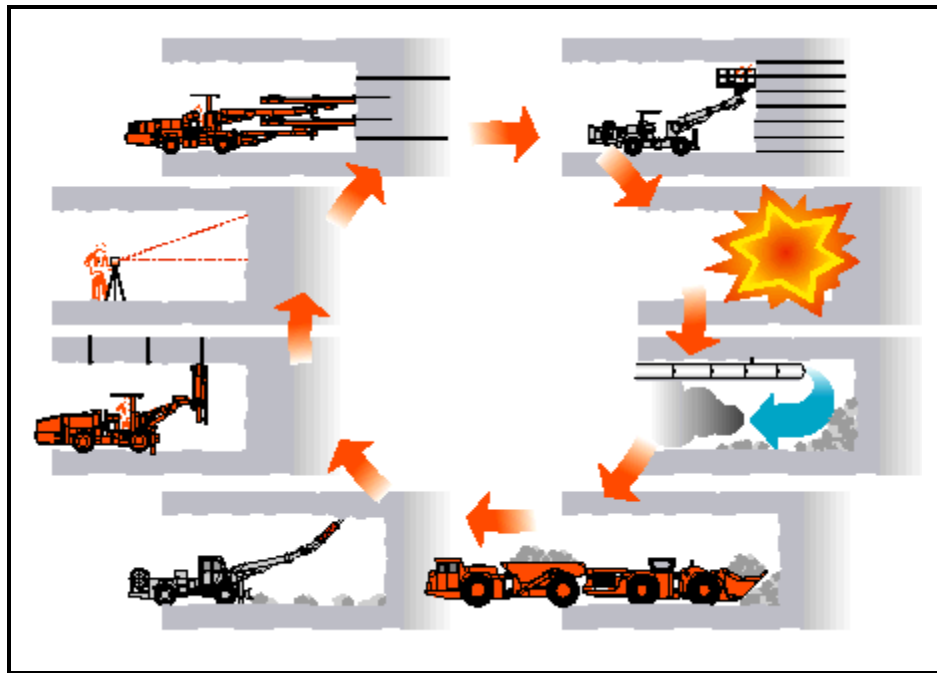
Typical Drill and Blast Excavation Cycle
